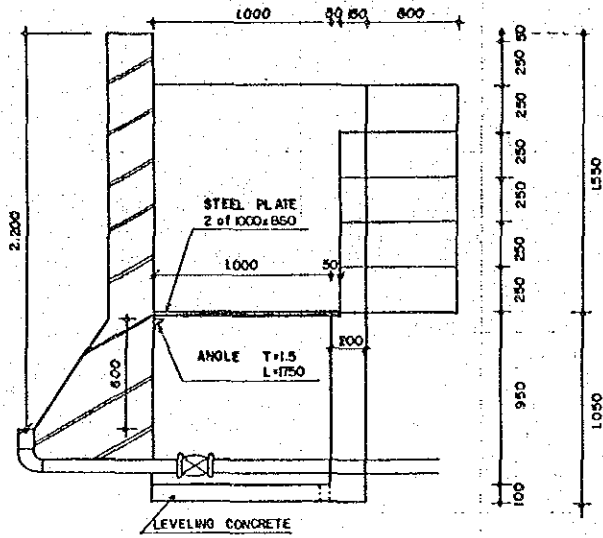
DETAIL OF PIPING IN ANAEROBIC TANK S=1:20
